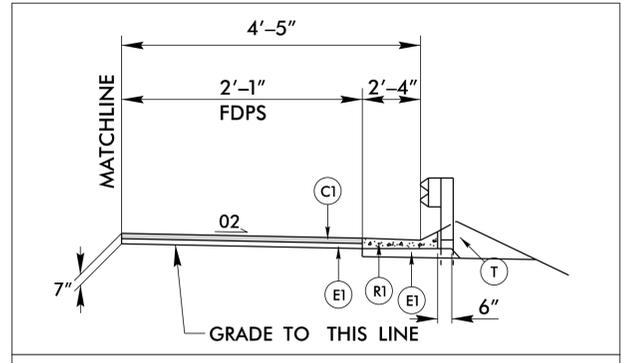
DETAIL SHOWING NOTCHED PAVEMENT PROFILE TIE-IN
